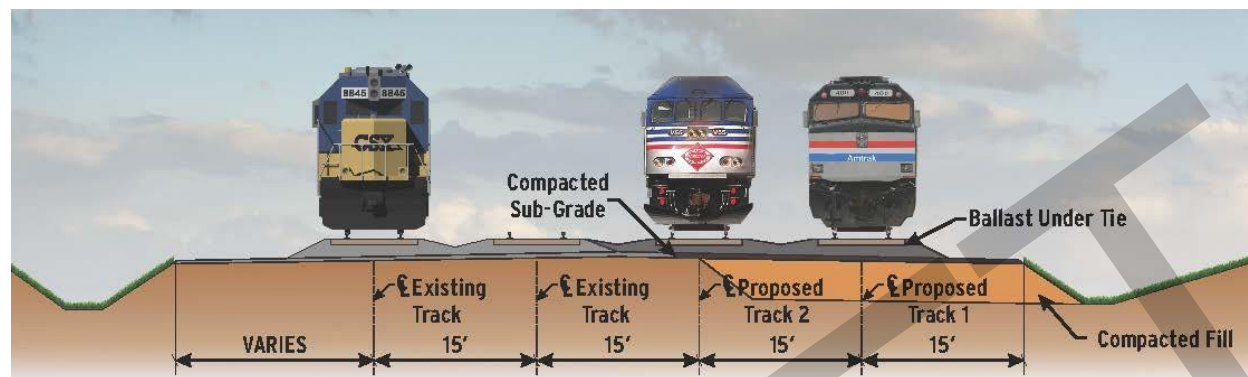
FOUR TRACK TYPICAL SECTION.
